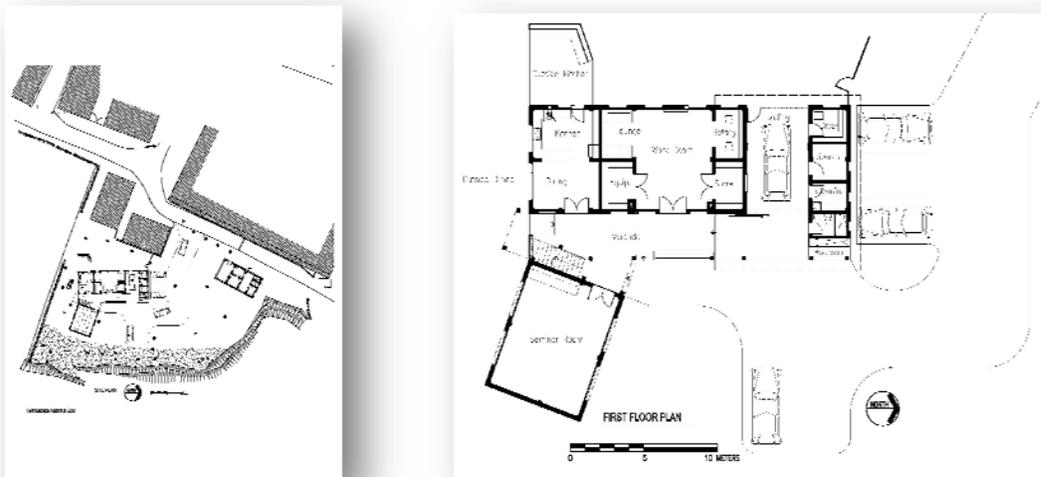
Madagascar: site plan and first floor plan of Biodiversity Center. Source: Fieldwork.
